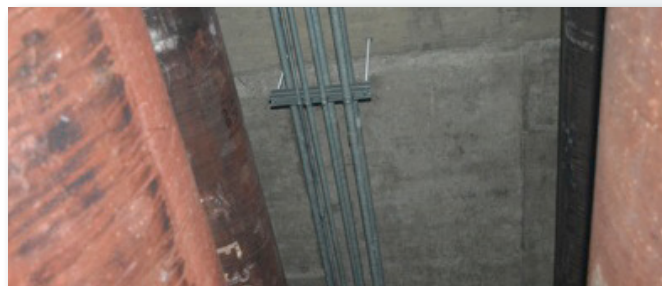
Zion Station Unit 2, main steam-tunnel cabling in the overhead.
